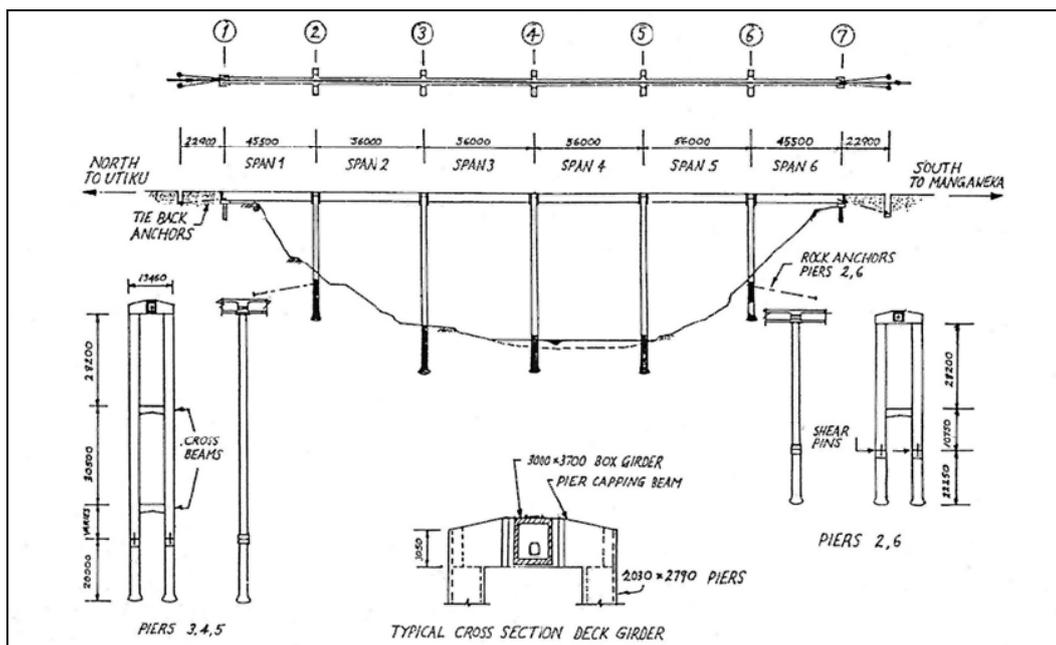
Elevation of SRRB and typical cross sections (Source: (Tilby 1981))
